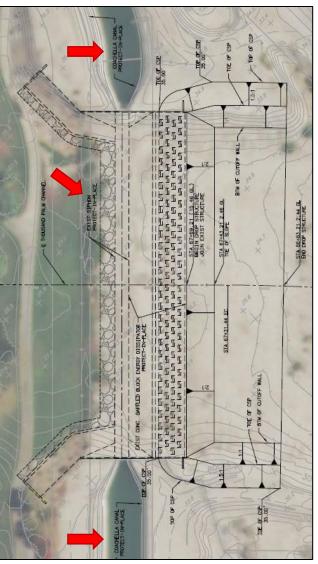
Proposed design of Thousand Palms Stormwater Channel Drop Structure over the Coachella Canal siphon which will be protected in place (red arrows). Source: Q3 Consulting.
